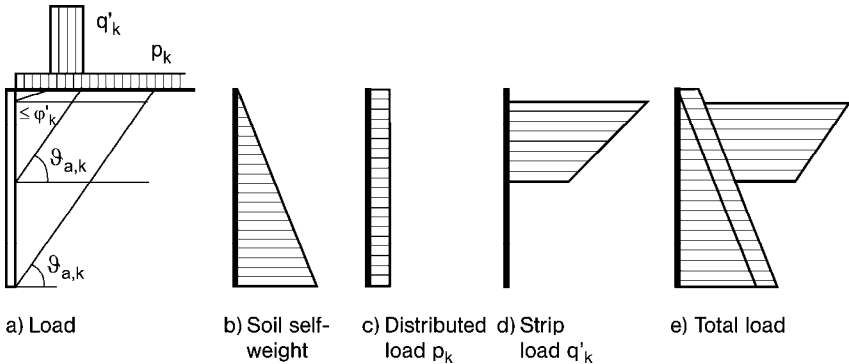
Earth pressure distribution for an unsupported retaining wall, with a fixed earth support in cohesive soil, assuming a minimum earth pressure (example)
